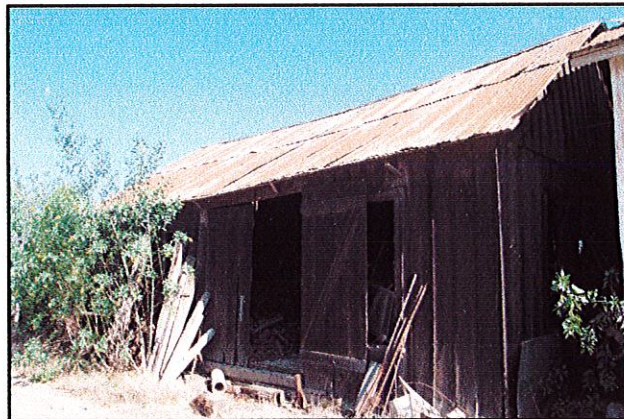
Ancillary wood barn, ca. 1915. This view is facing northeast, toward the west (primary) elevation. Photograph date, November 5, 2002.
